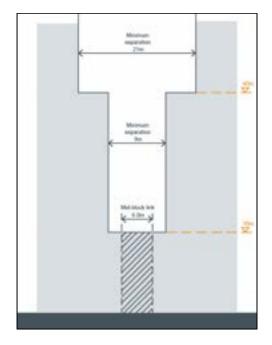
Solid walls with non-habitable room windows are used for end elevations to manage privacy impacts
